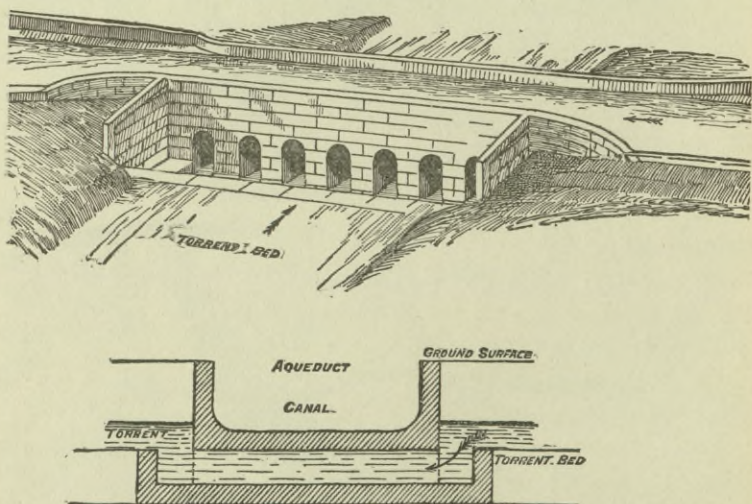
SOANE CANAL. CROSS-SECTION OF KAO NULLA SIPHON-AQUEDUCT.
